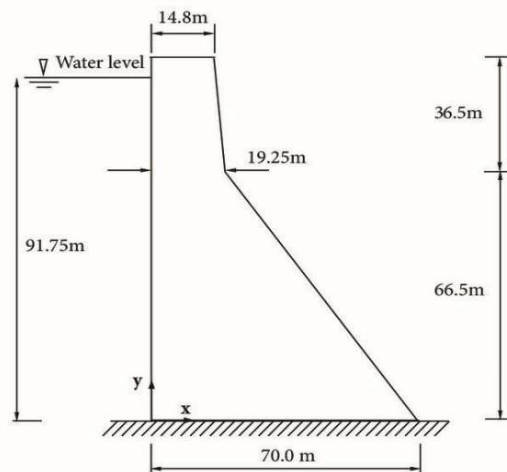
Cross-section of the Koyna Dam showing dimensions (Pekau and Feng 1995).
